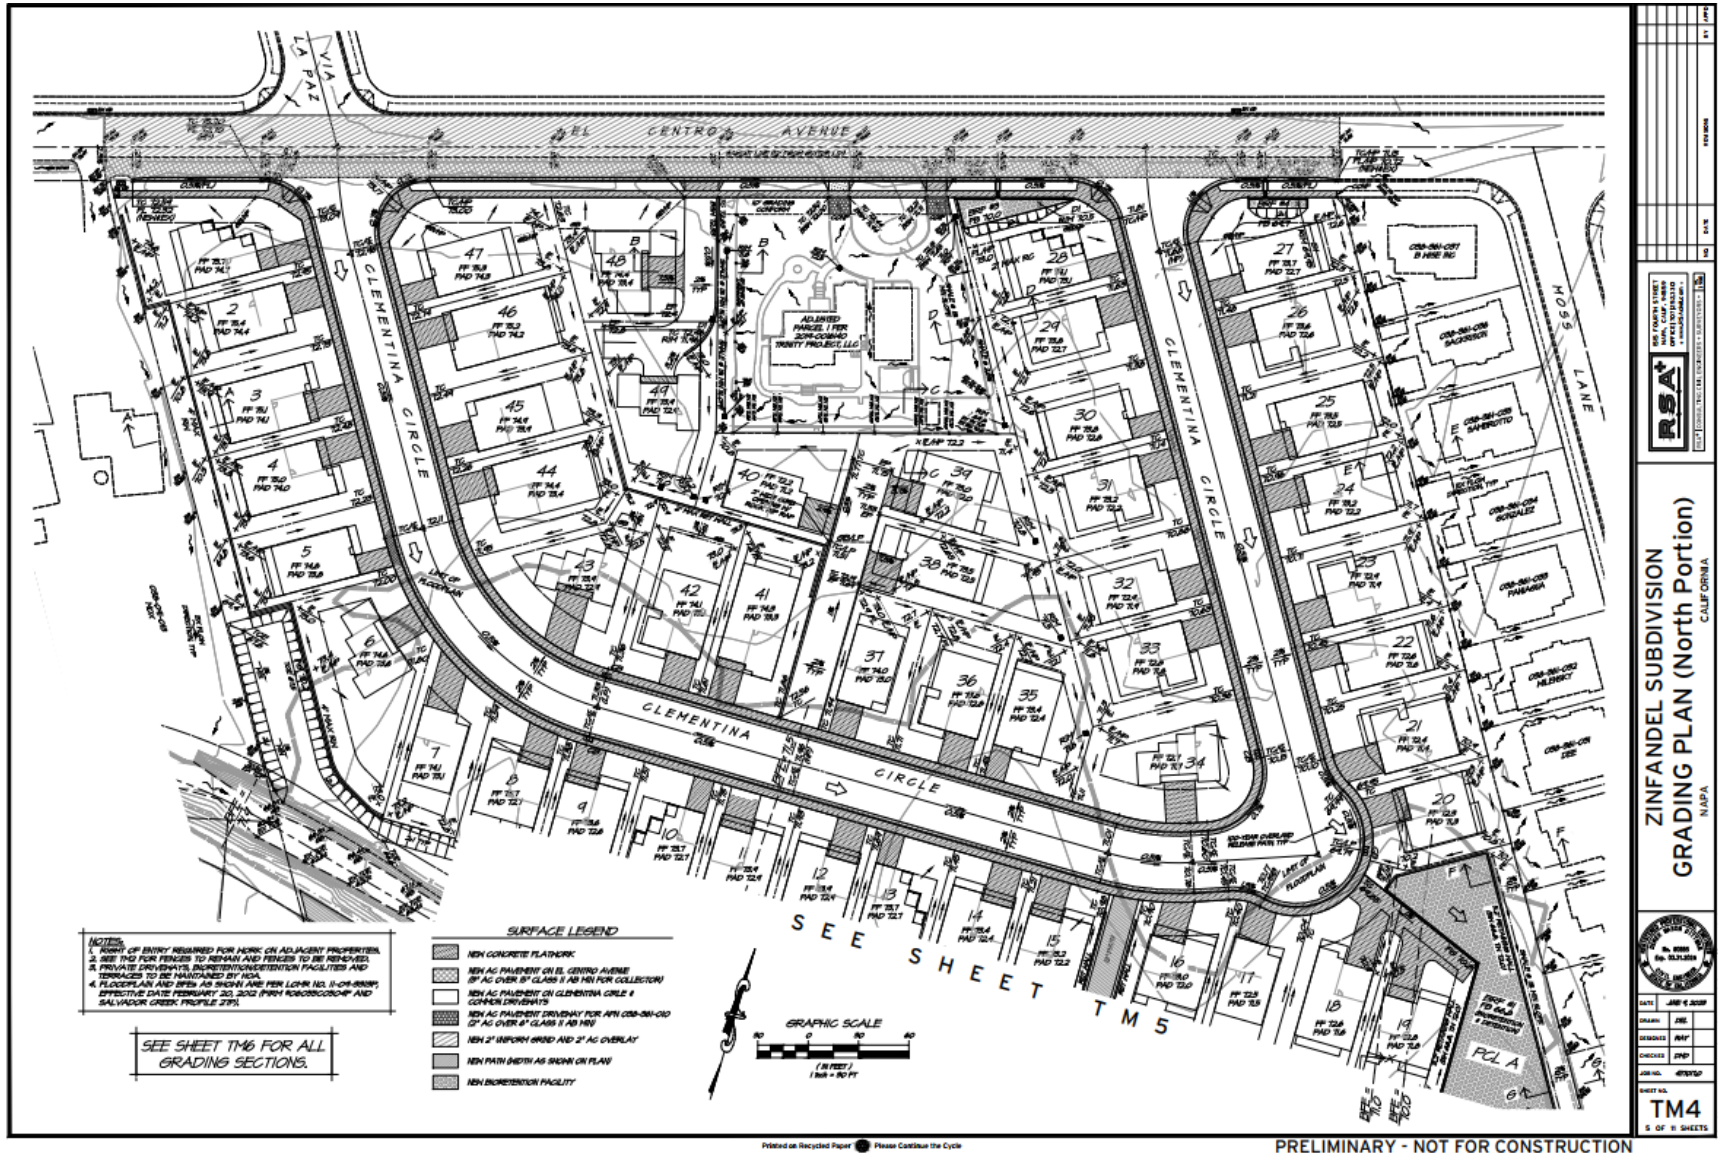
Design plans provided by RSA+ for Alternative 2 (north section).
